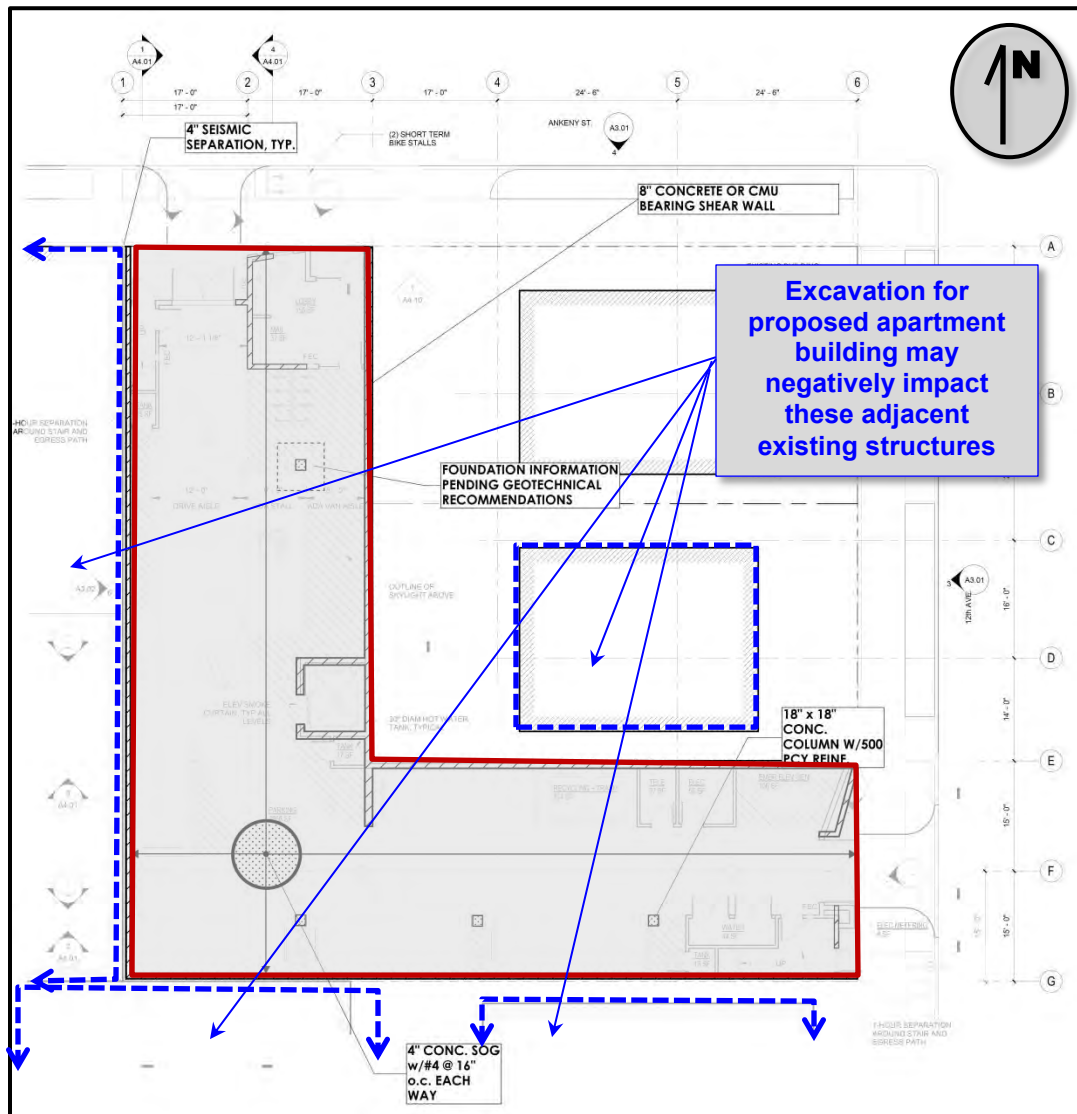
Adjacent buildings potentially influenced by site excavations.
